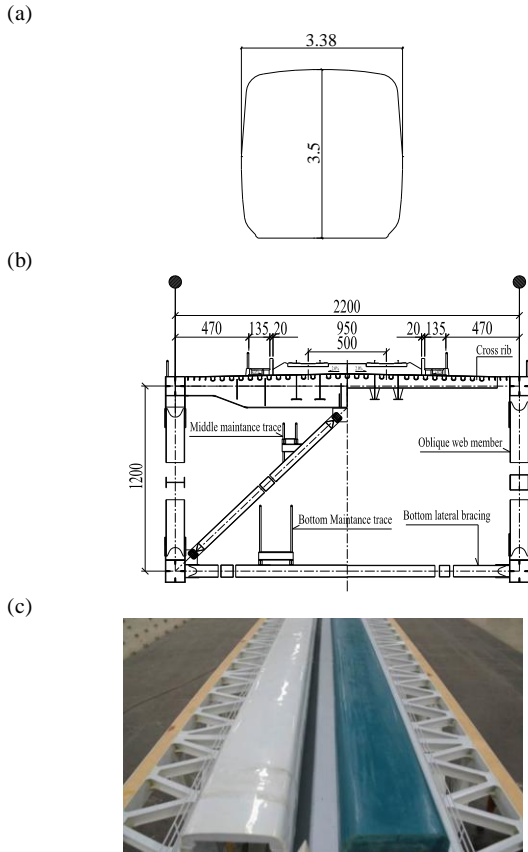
Cross sections of the train and bridge deck (a) Cross section of the train (unit: m); (b) Cross section of the bridge deck (unit: cm); (c) Vehicle models and bridge model
